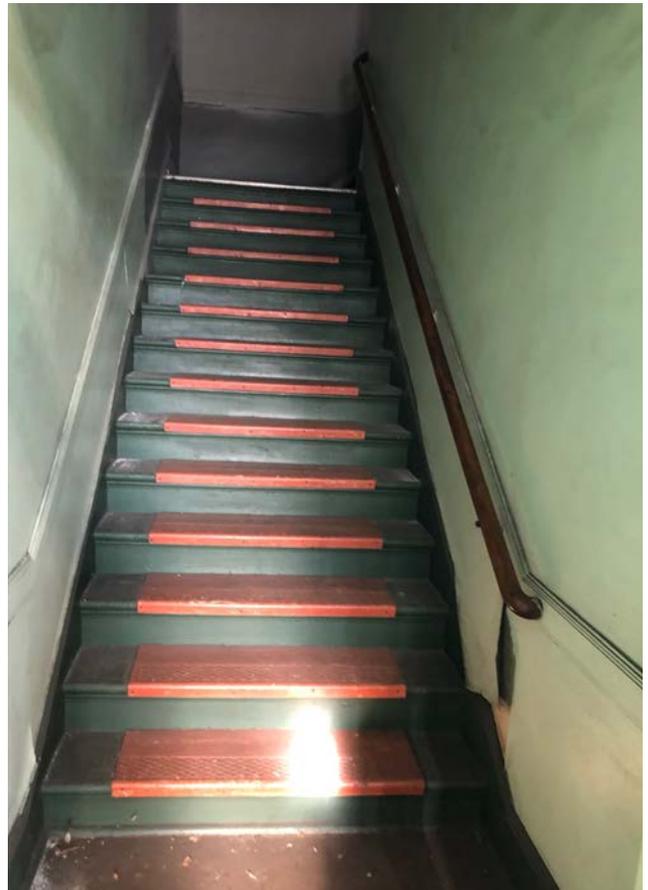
First floor, entrance vestibule, looking north, showing the stairs to the former IHC show room and offices.
